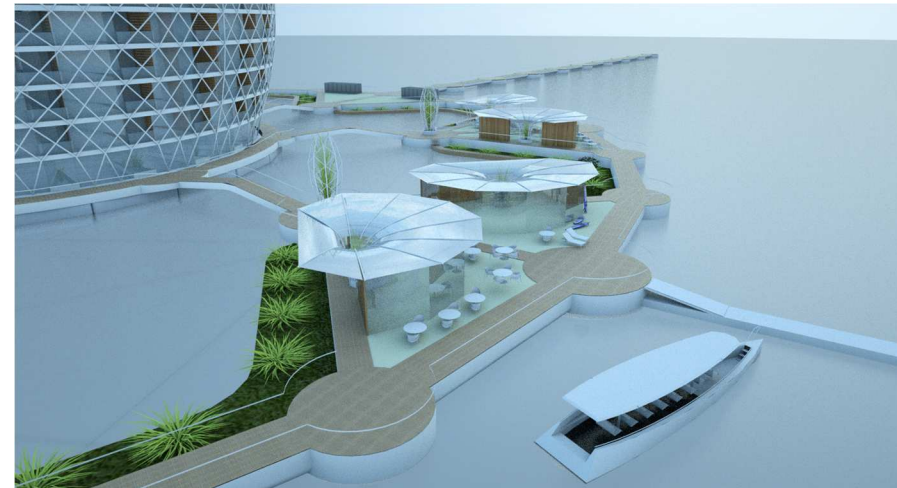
Rendering showing the business space and recreational space ETFE roof covers used for rainwater collection.
